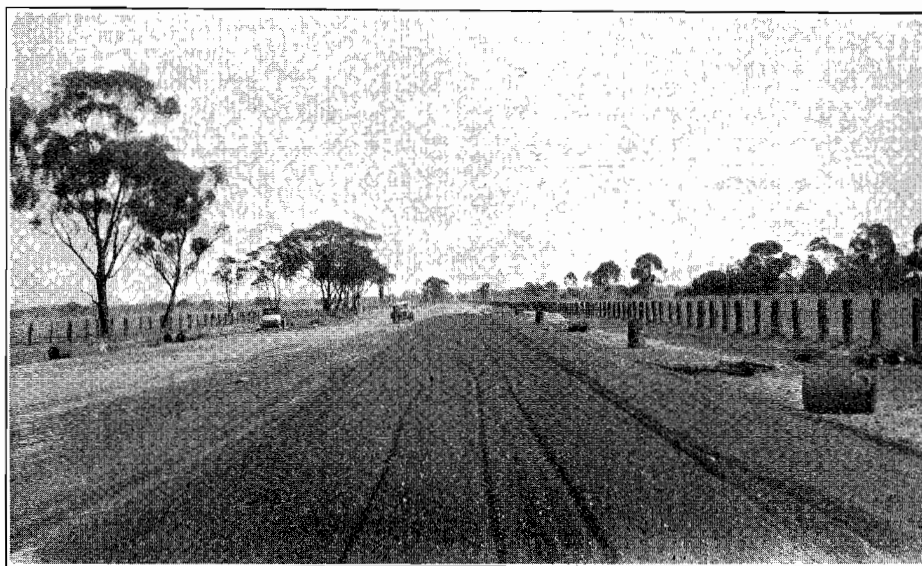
Calder Highway. Mixing completed. Consolidation was carried out with a horse roller, as traffic would not use the pavement sufficiently.
